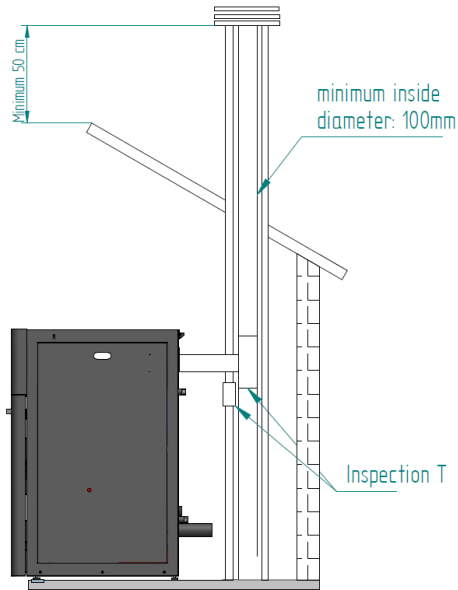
Side view of the boiler installation with a shaft, highlighting the inspection point
